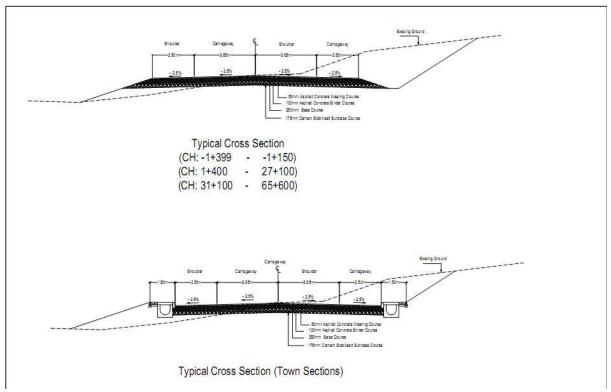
Typical Cross-Sections of Project Roads 1 & 3
